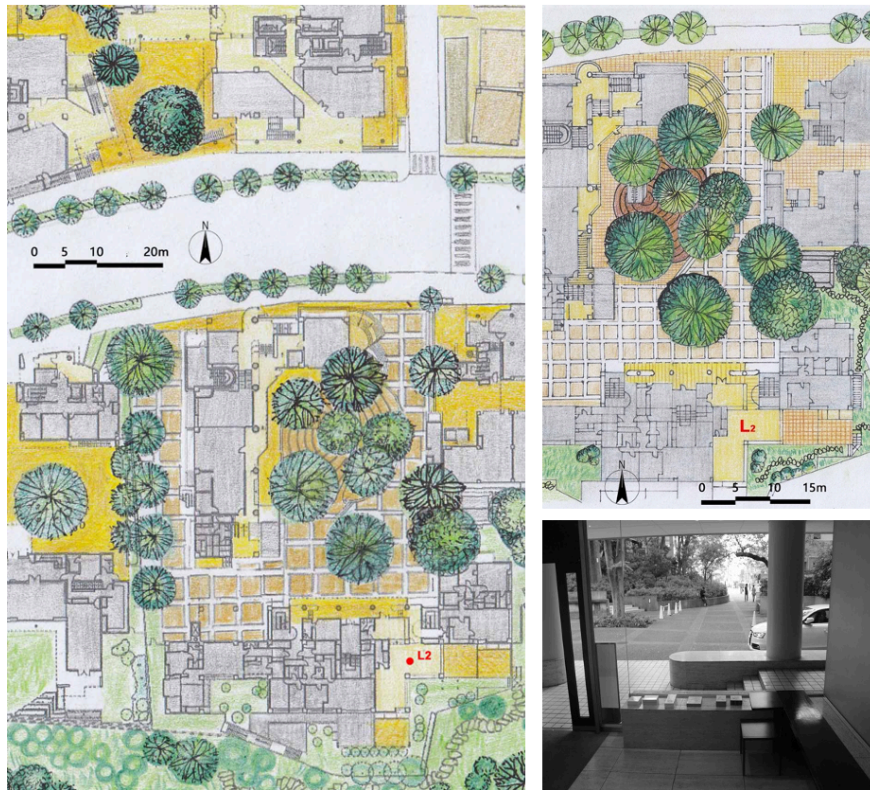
The lobby (L) in Building E. (Source from: drawing and photo from the author)
